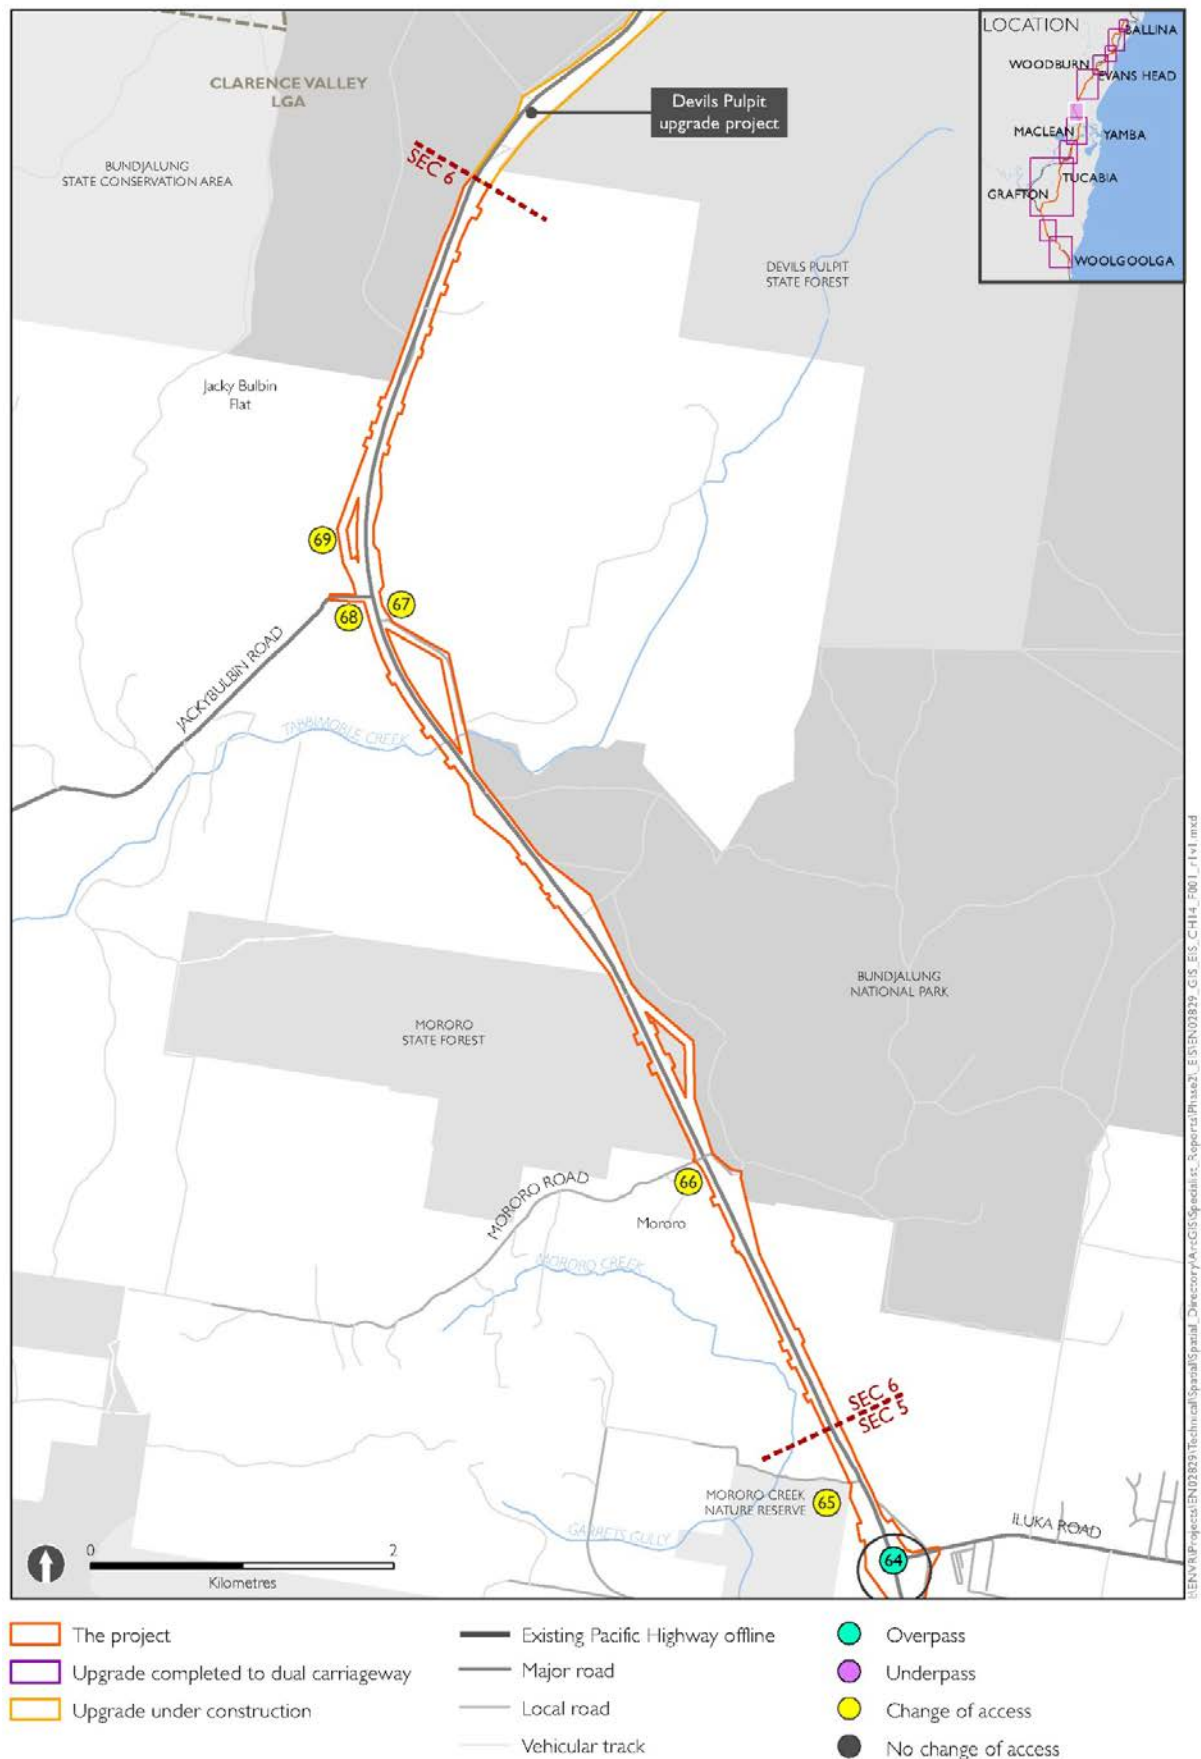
Locations of road alterations or changed access arrangements: Section 6
